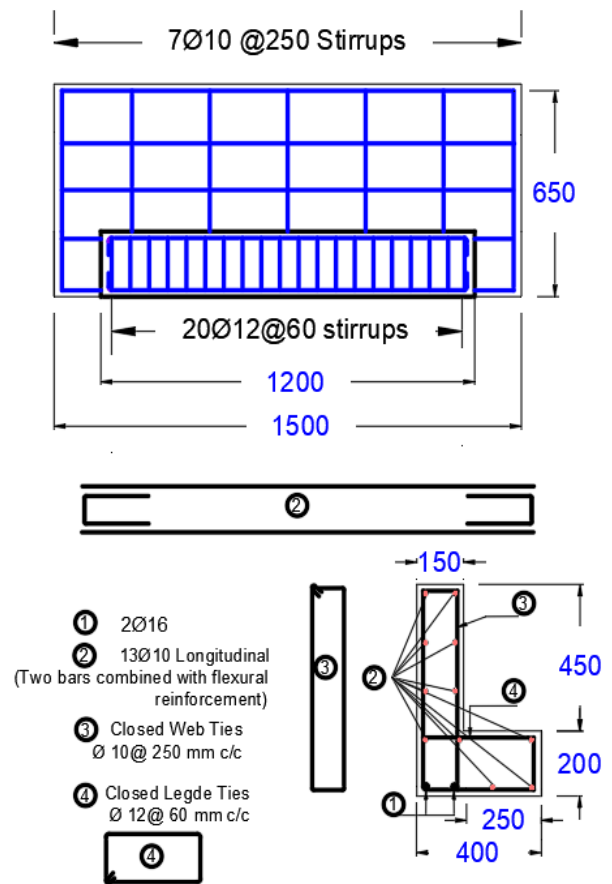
Reinforcement details for tested spandrels. (all dimensions are in mm)
